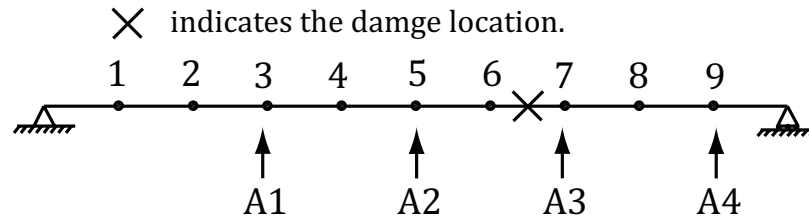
Simply Supported Beam Model Arch Bridge
